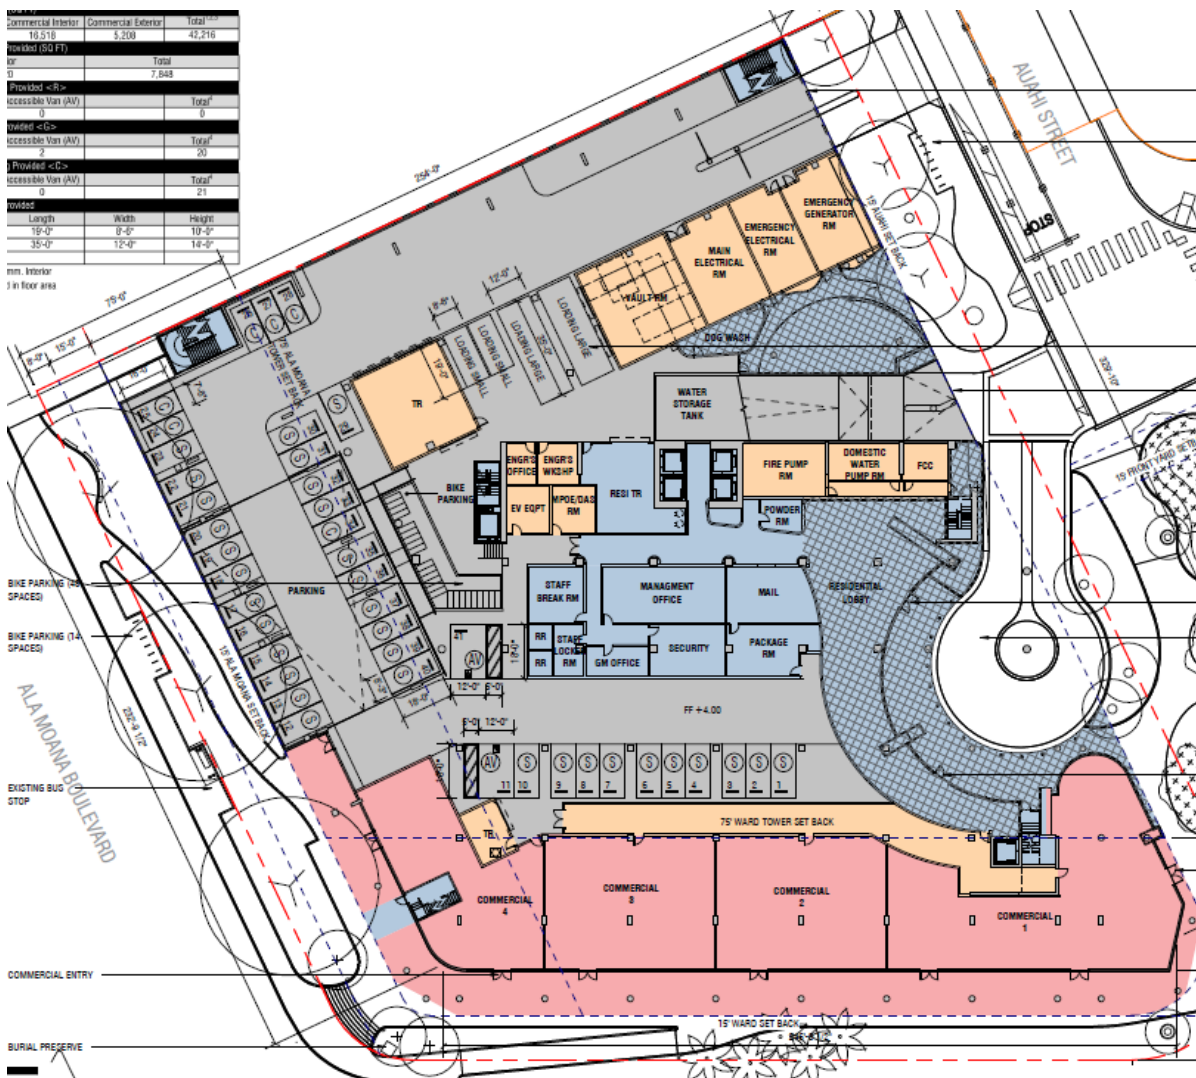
below was provided by the Applicant in its Permit Application, Exhibit 7.
